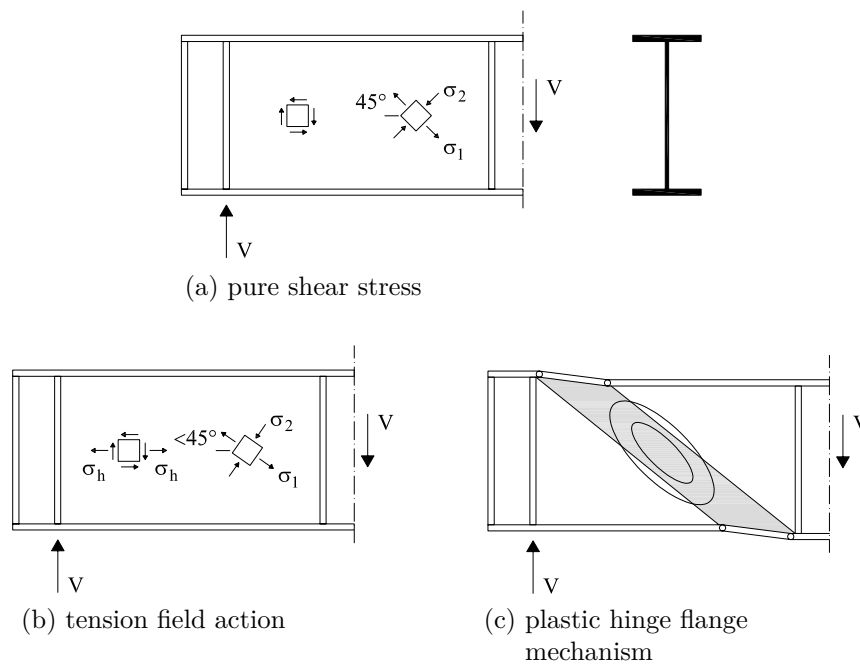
Stress states and collapse behaviour of an I-plate girder subjected to shear
